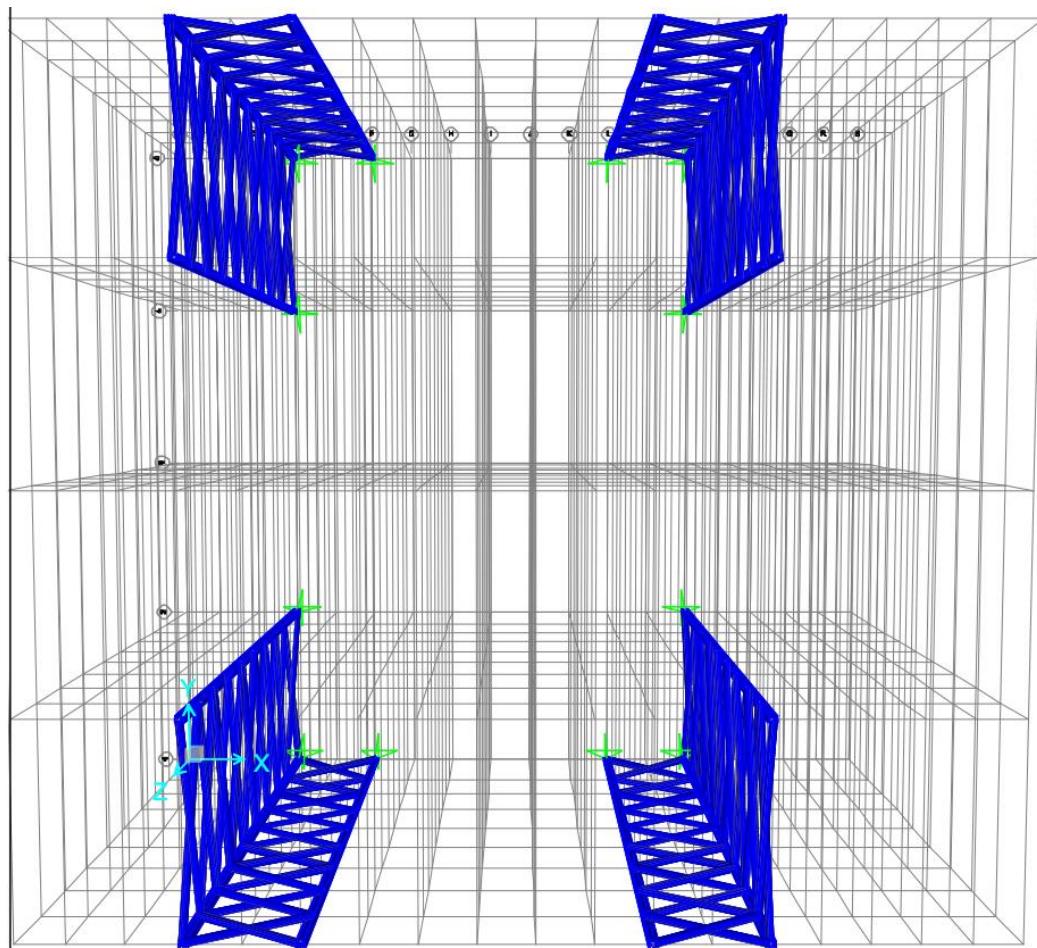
Designed location for 8 bracing systems (Plan View)
